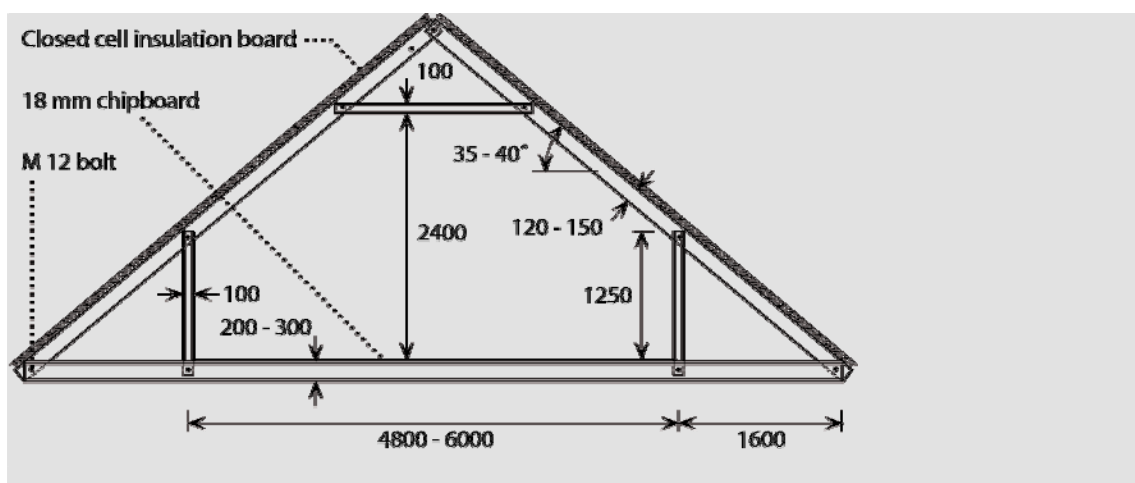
Typical 'open' steel roof system using cold-formed sections
